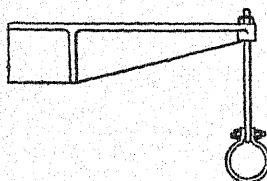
Elevation and Plan of Bracket and Sling for Pipes.
